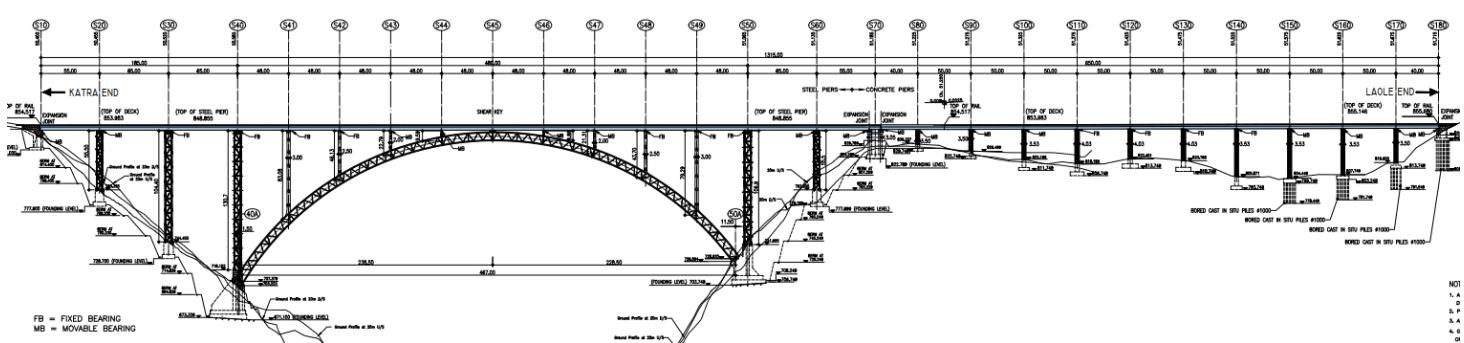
The elevation of final bridge concept. Click on the image to open it in a higher resolution
